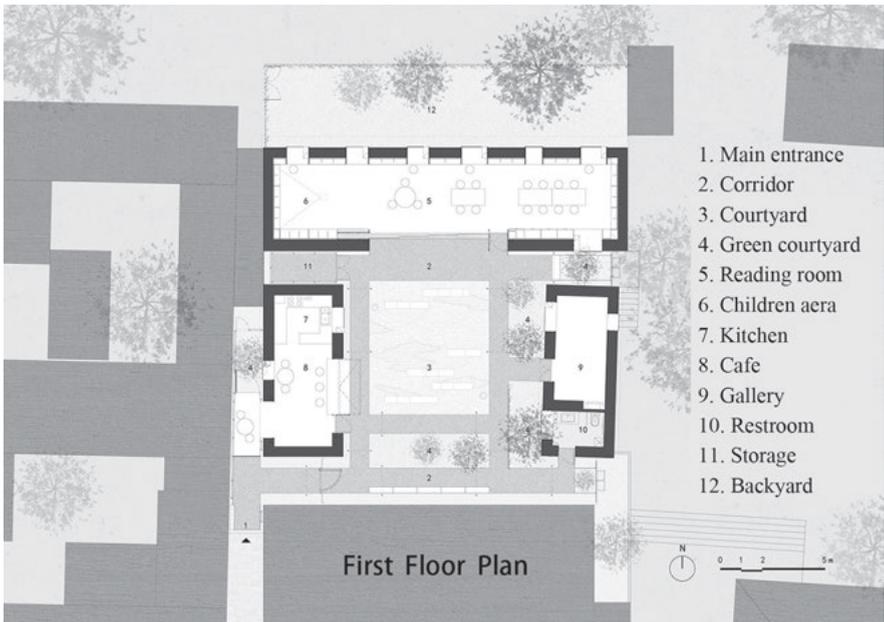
First floor plan. © Suochengli Neighbourhood Library.
